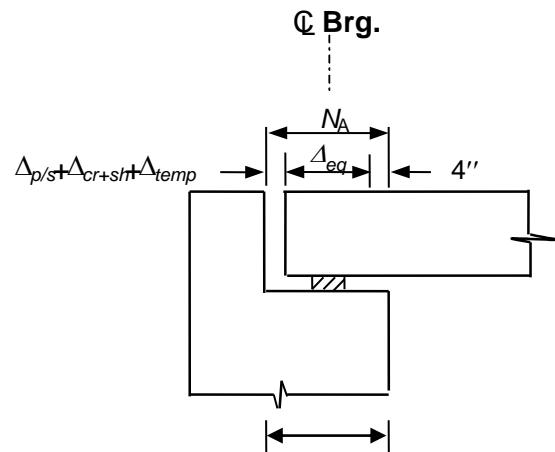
Abutment Seat Width Requirements
